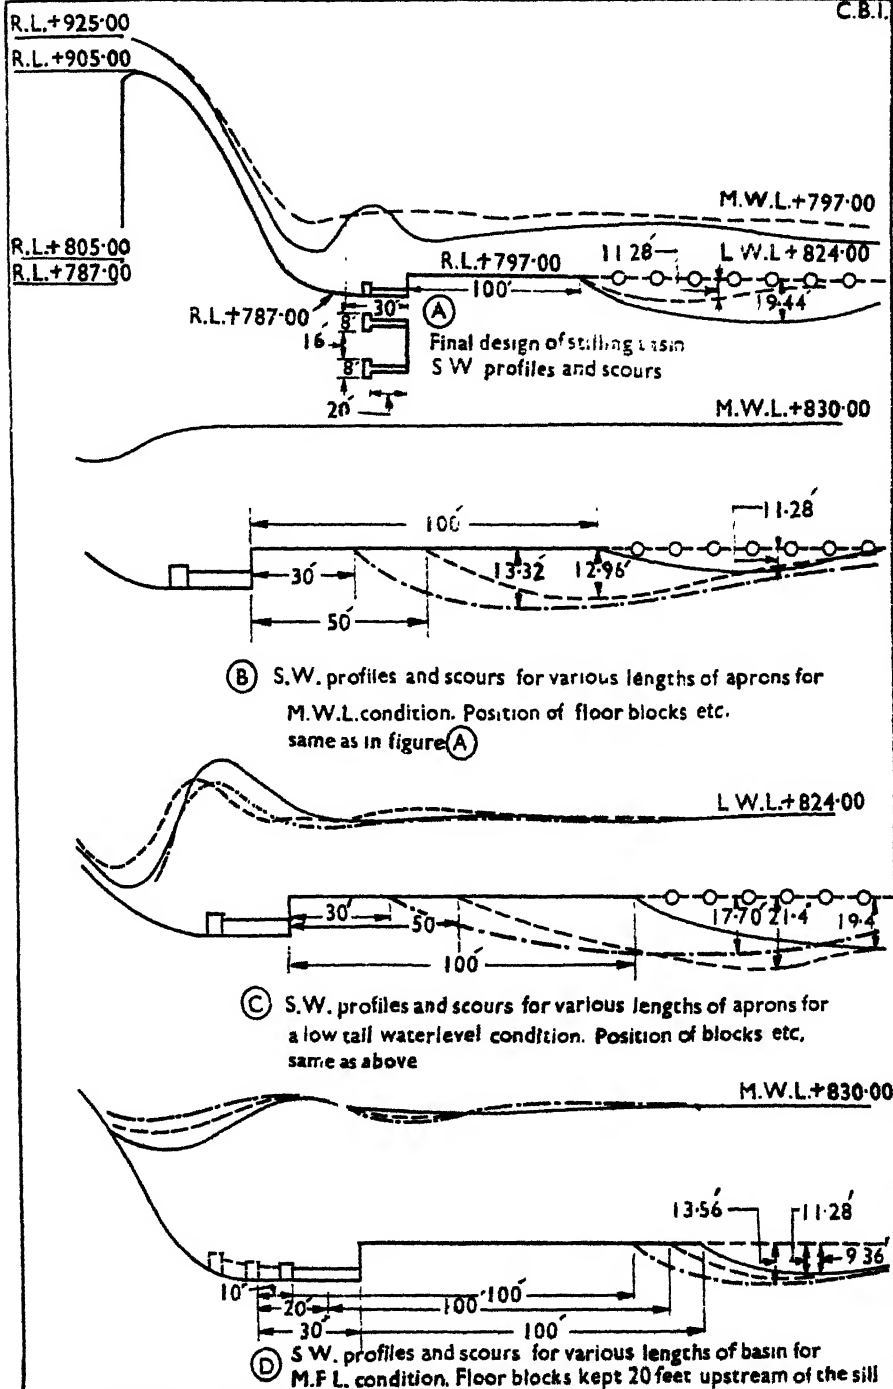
C.17: Lower Bhavani Spillway Dam 20 feet overflow section
